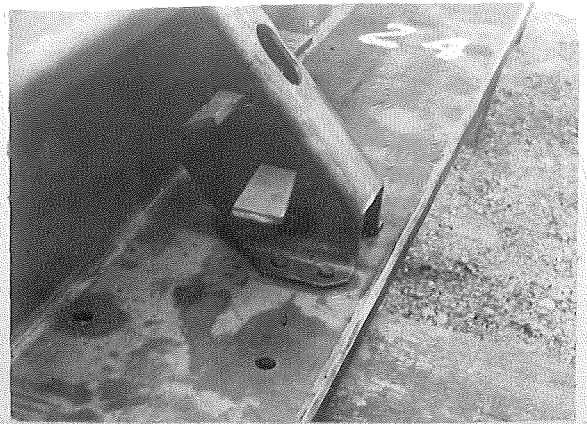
View showing gap between lower end of stake pocket and edge of base on a 9" base form
